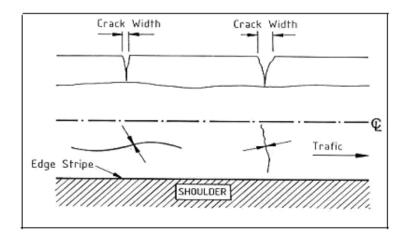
Longitudinal and Transverse Cracks (GTC, 1998)
